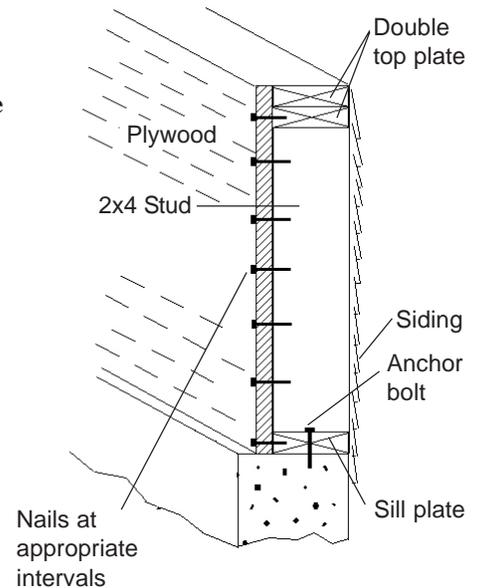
Plywood or diagonal sheathing strengthens weak cripple walls. If your home has a cripple wall between the foundation and the first floor, and the wall is not braced with plywood or diagonal sheathing, the house may fall or shift off its foundation during an earthquake.
